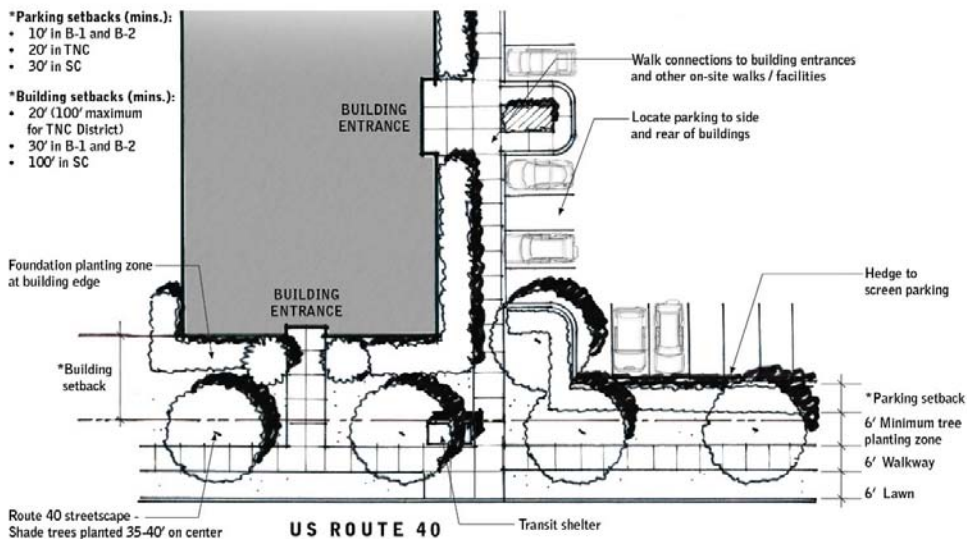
E: Route 40 Frontage Plan Enlargement (Back of Curb)
